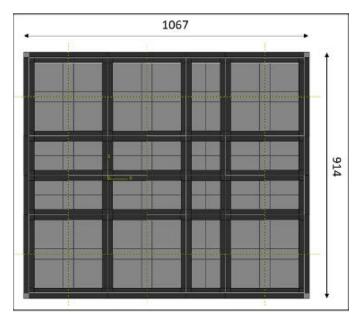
Sample model home floorplan (dimensions in cm) (*Source:* Authors, 2023).
